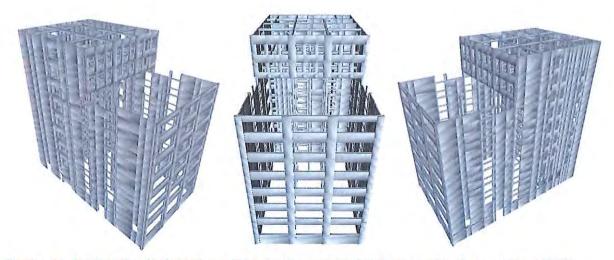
Earthquake (lateral) resisting system comprising concrete shear walls and RC frame (north elevation) on basement walls
